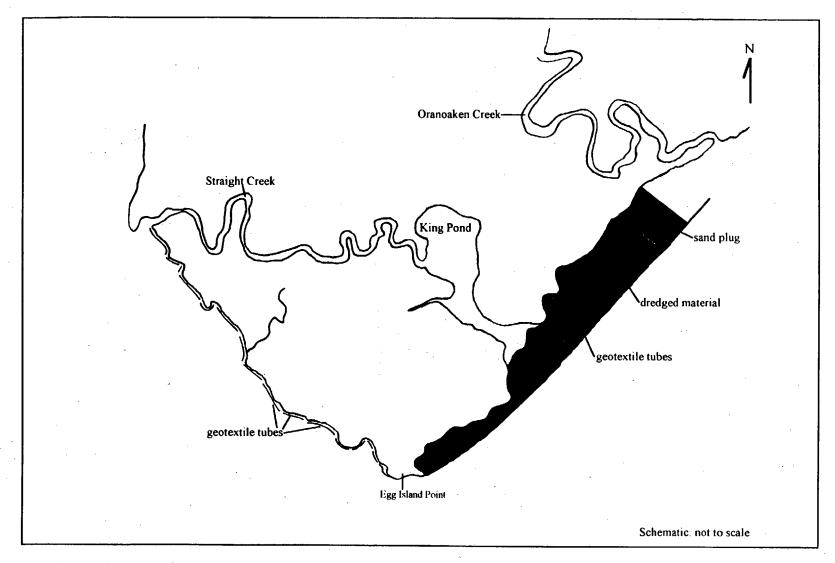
Preliminary shoreline stabilization and marsh restoration plan for Egg Island Point, New Jersey (overhead view).
